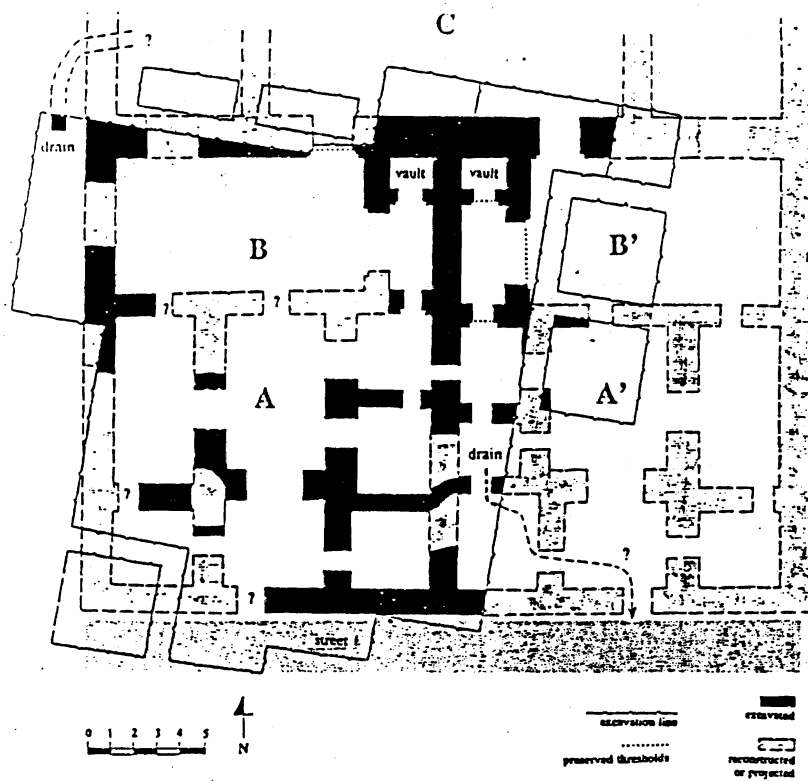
Floor plan of Royal Storehouse AK (Stratum B12)
